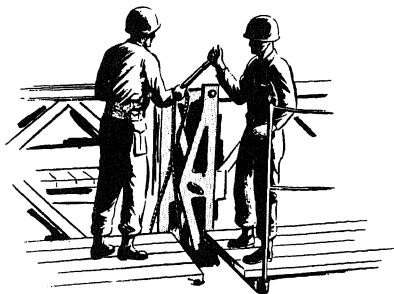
Connecting bays with special connecting posts. Jacking the truss.
